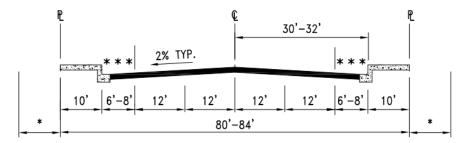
Existing Typical Section for Secondary Arterial (Commercial Street)
